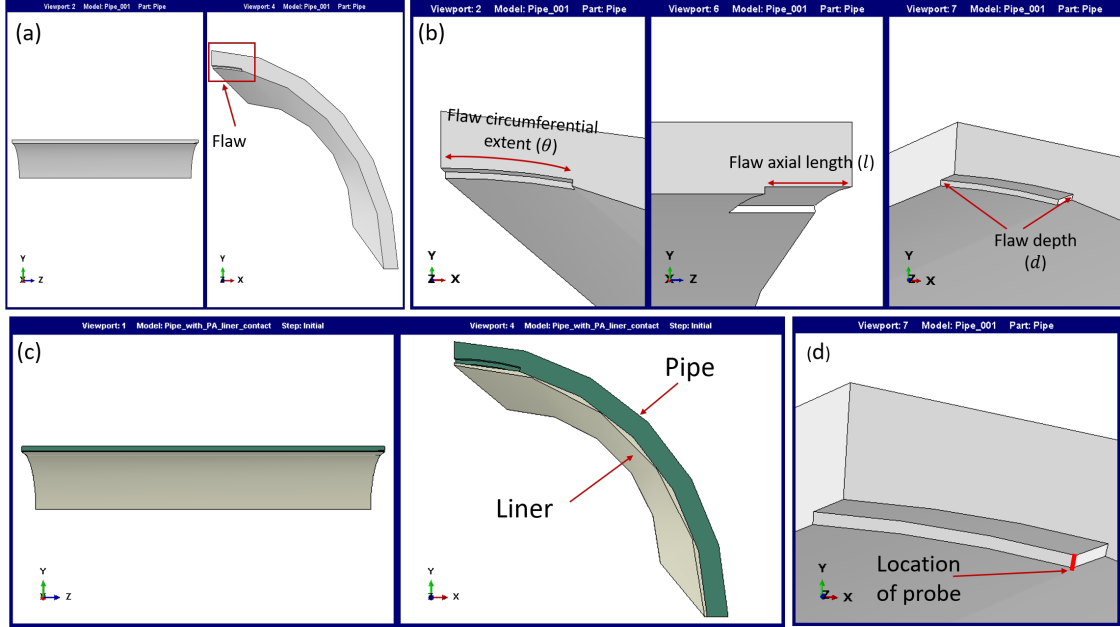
(a) Simulated host pipe geometry. View which is parallel to the pipe axial direction (left). View which is perpendicular to the pipe axial direction (right). (b) Geometry of the corrosion defect. (c) Host pipe-liner assembly. (d) Line (highlighted in red) located at the corner of the corrosion flaw, used as the stress probe over which the von Mises stress is averaged.
